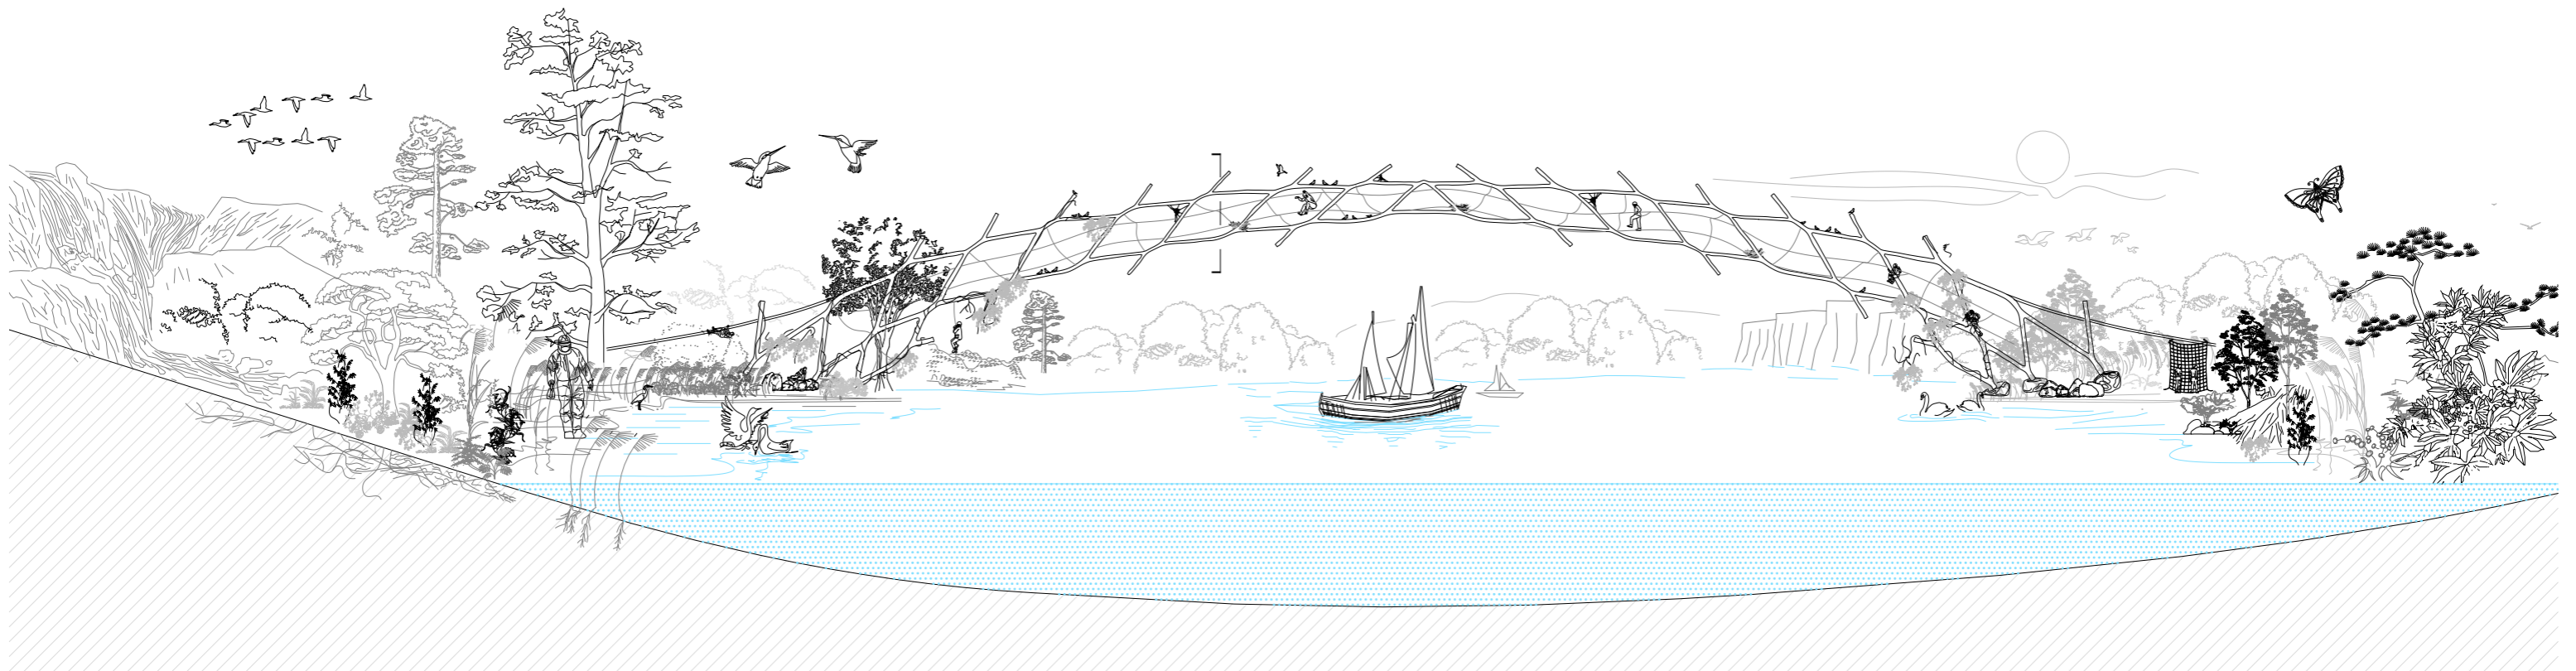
Bridge in elevation over the quarry lake | Nolan | 2023
